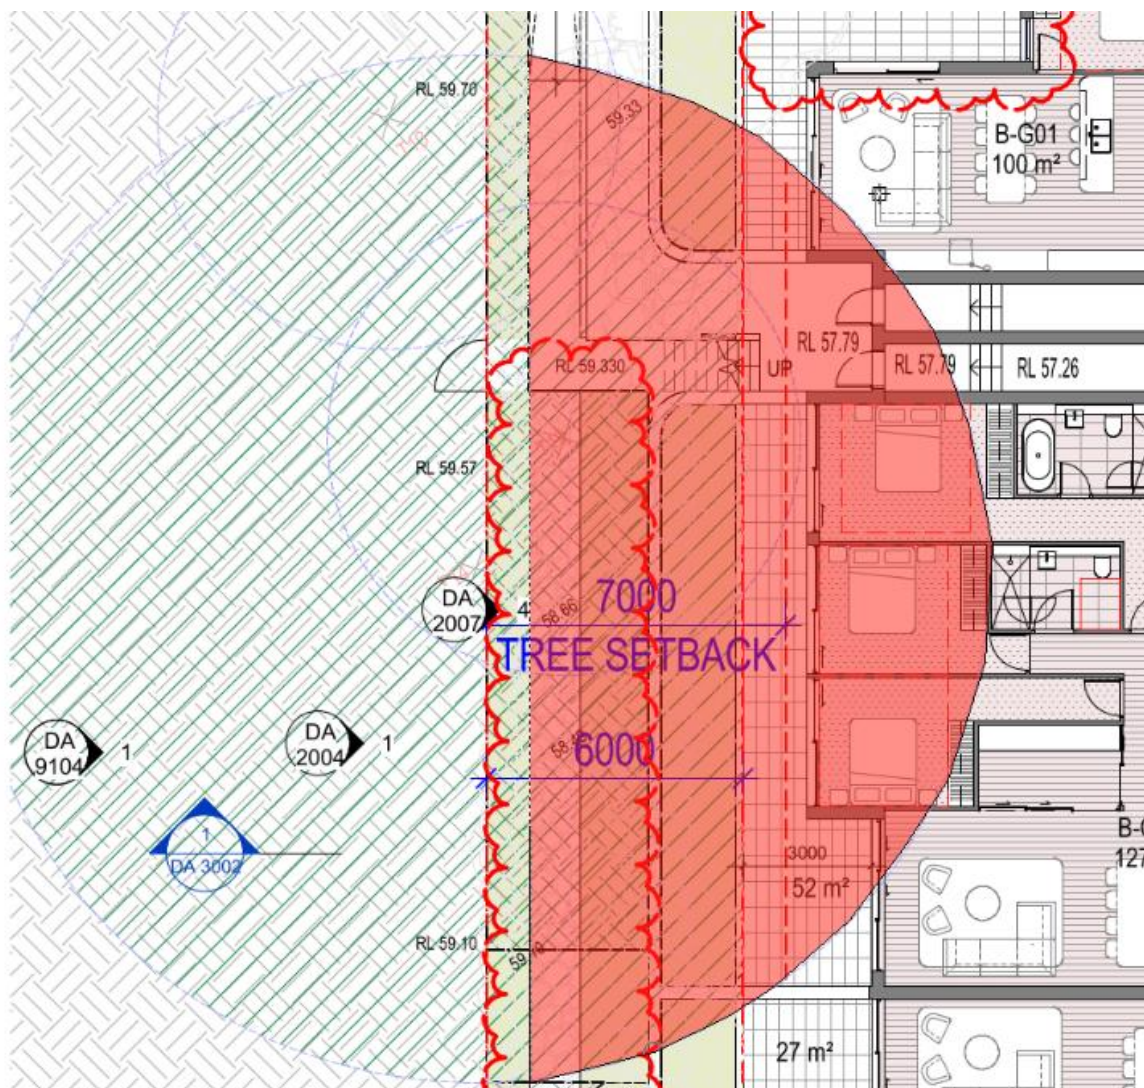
Tree encroachment plan (Source: Council's Landscape Officer)
